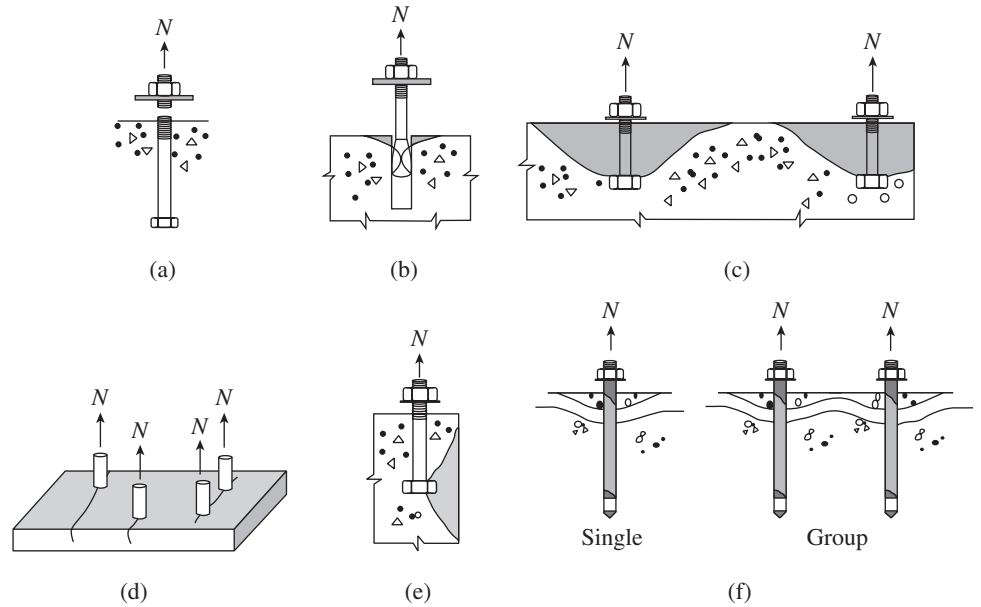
Failure modes for anchors under tensile loading (a) Steel failure (b) Pull-out (c) Concrete breakout (d) Concrete splitting (e) Side-face blowout (f) Bonded anchors
